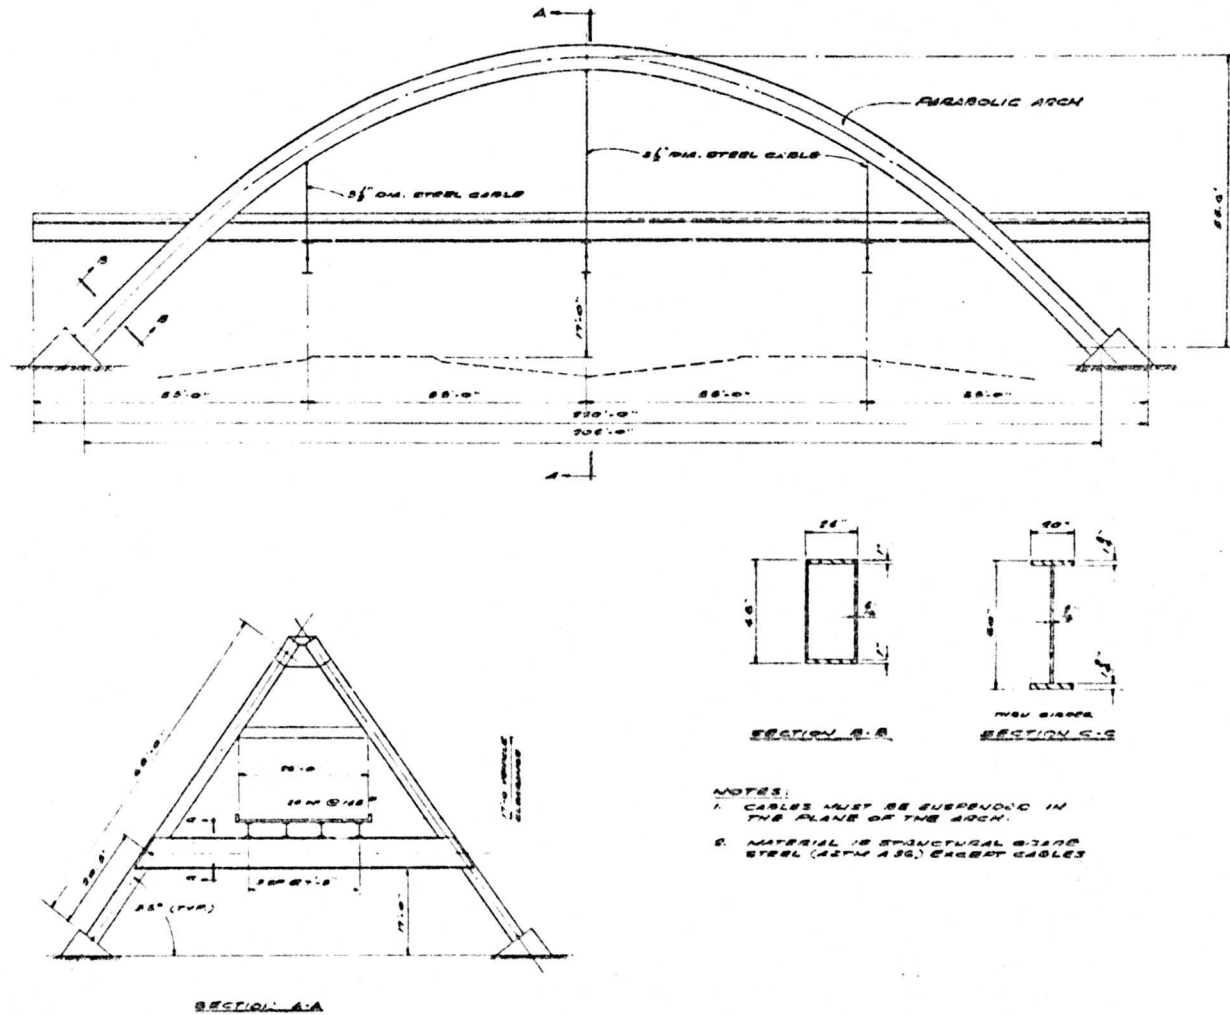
PRELIMINARY DESIGN DRAWING OF LEANING ARCHES BRIDGE CONCEPT IN MODIFIED BRIDGE APPLICATION
